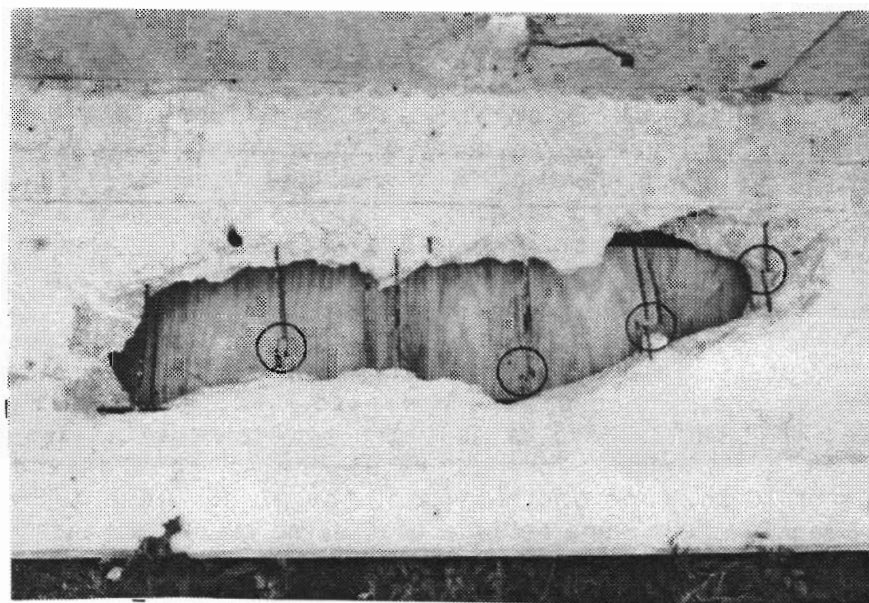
Beam 2, north shear span, web concrete removed to expose fractures (stirrups separated horizontally for clarity)
